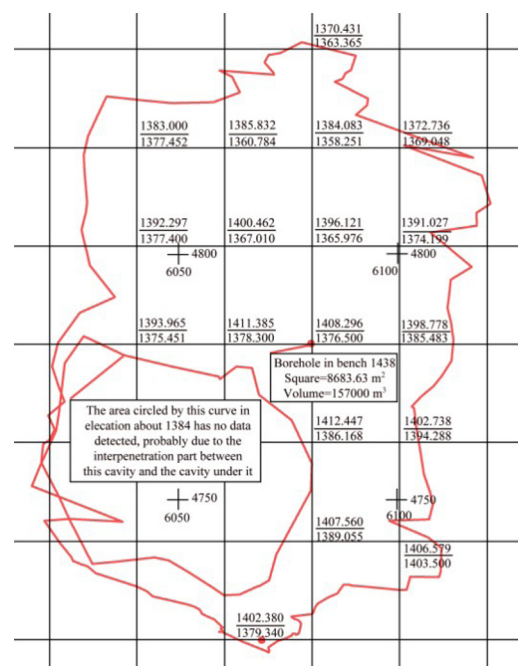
Cavity ichnography with roof and floor elevation of grid intersection point (unit: m)
